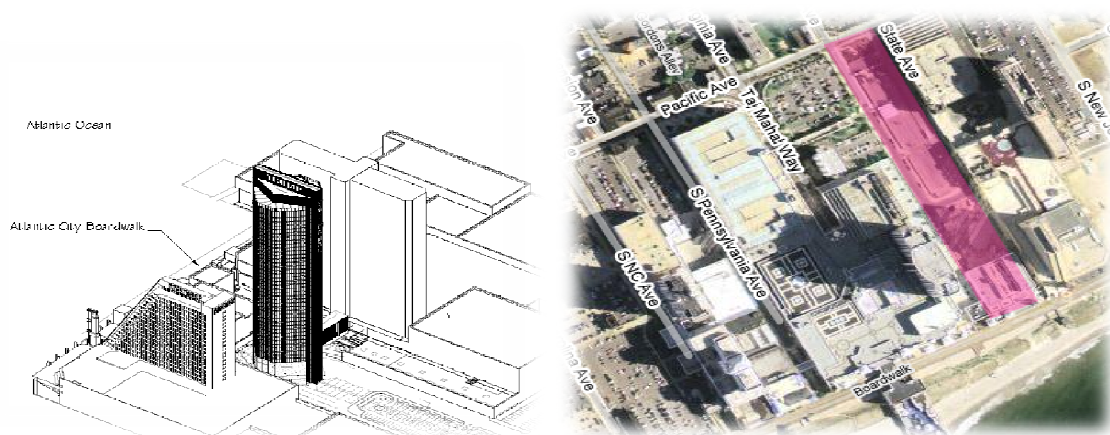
Layout and Site of the Trump Taj Mahal Hotel (provided by The Harman Group, Friedmutter Group, and Google Earth)
